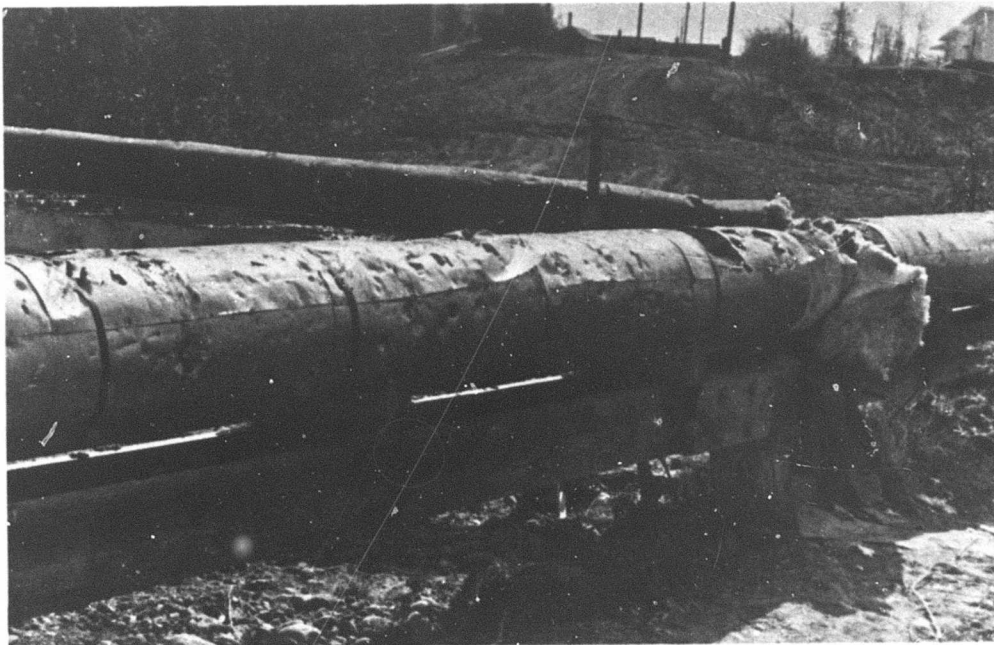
Sewerline to sewage lagoon at Inuvik, NWT. Urethane insulation and aluminum jacket damaged by vandals.
